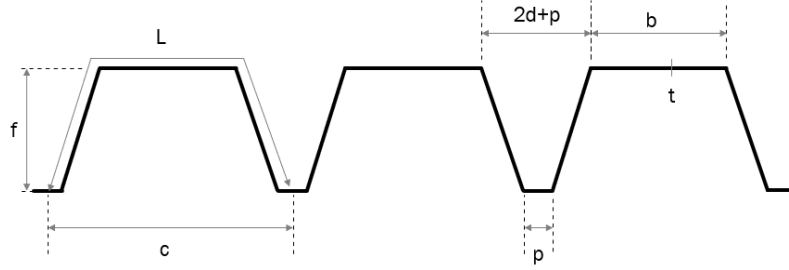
Cross section of corrugated steel sheet 106R-750
